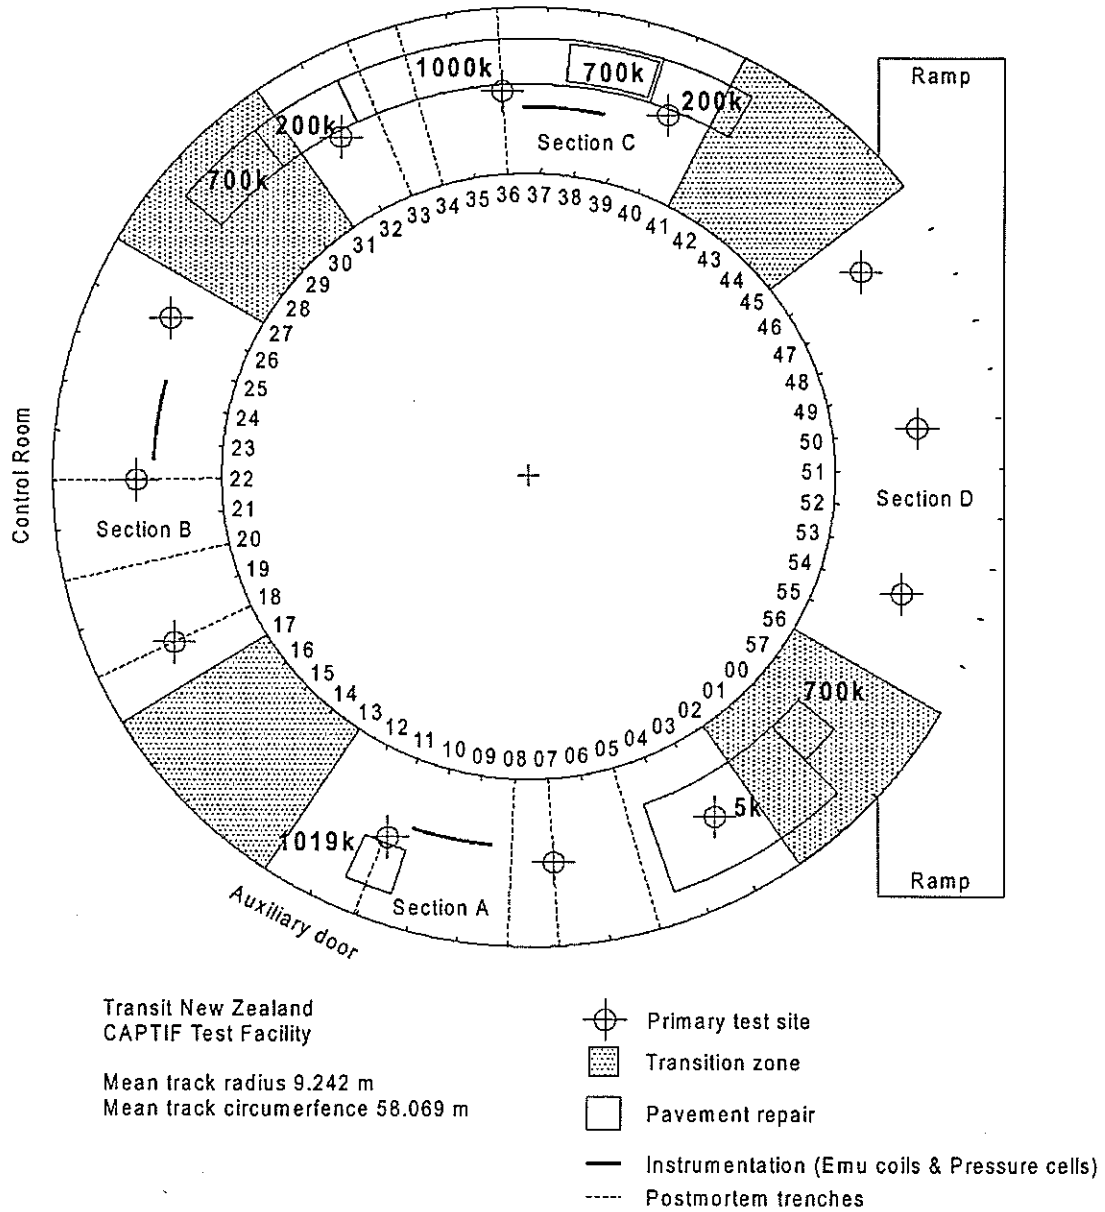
Plan showing the locations of the post-mortem trenches and surfacing repairs.
